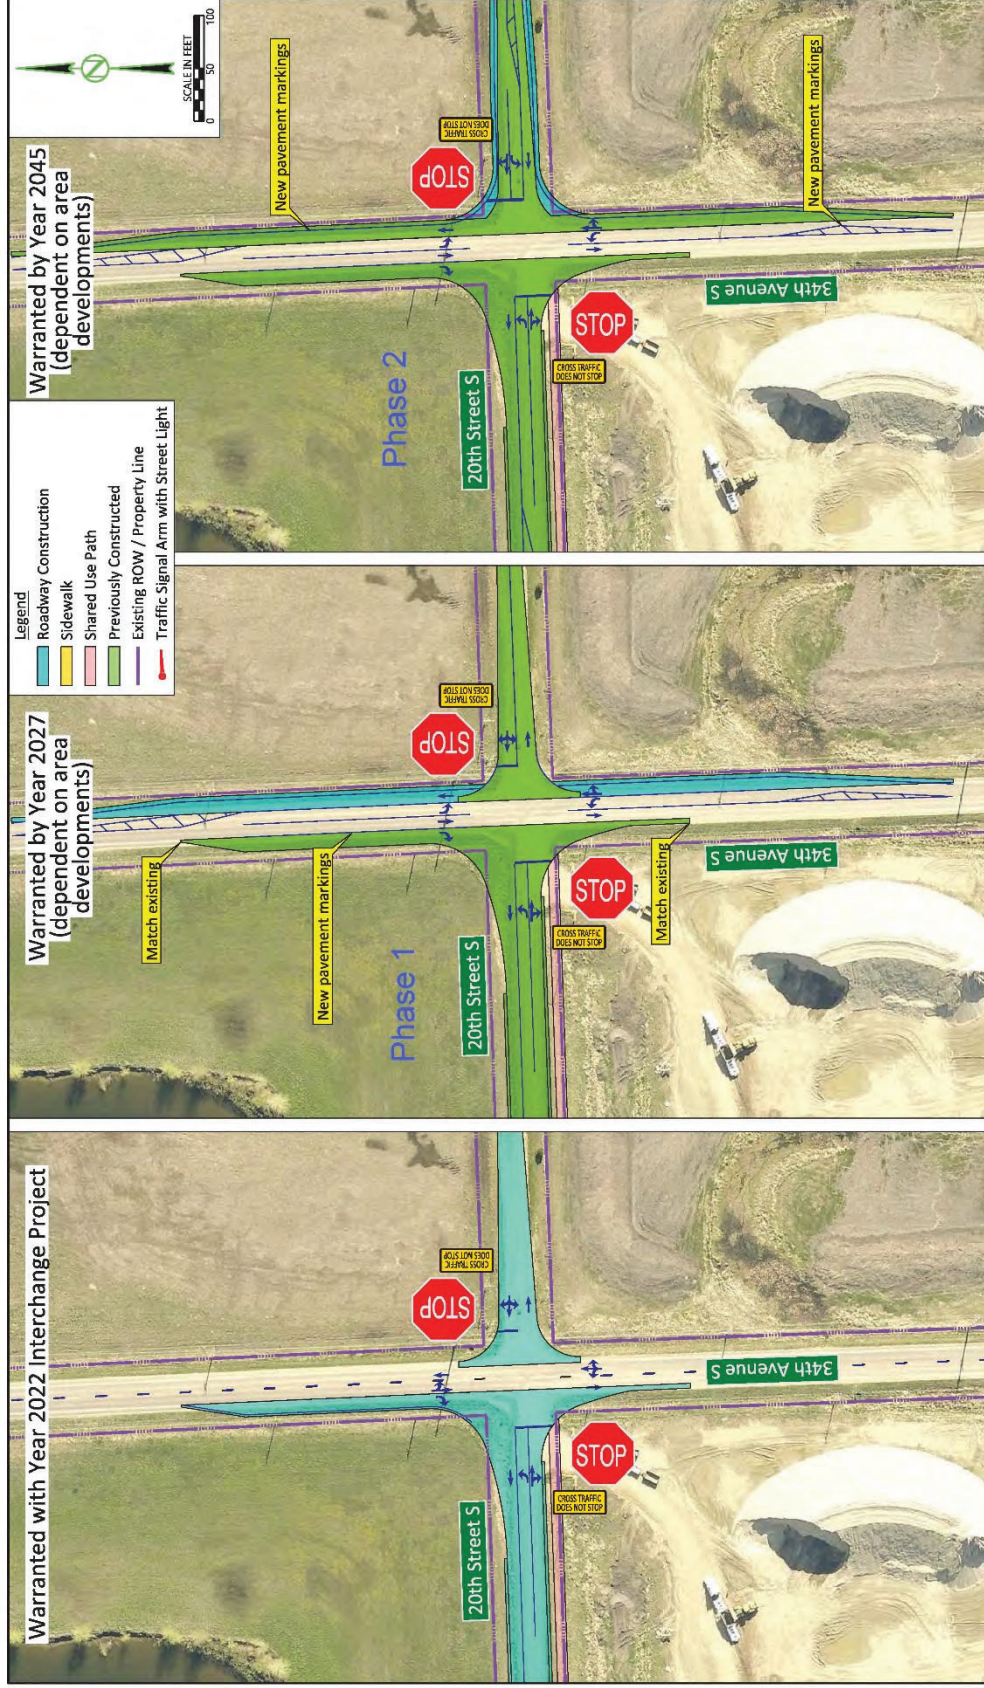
Proposed Improvements to the Intersection of 20th Street South and 34th Avenue South
